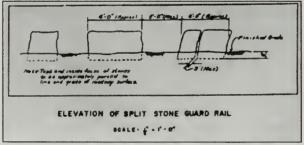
Detail of a guardwall on causeway and bridge at Frazer Creek, on the Schoodic Loop Road, 1957. (U.S. Department of Commerce, Bureau of Public Roads, Project 2A3, Sheet 2 of x, June 1957)
